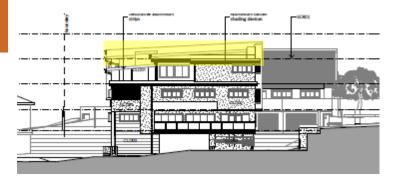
Proposed south elevation (Drawing No. DA-03.02 DA7)- yellow fill indicating the amended part
